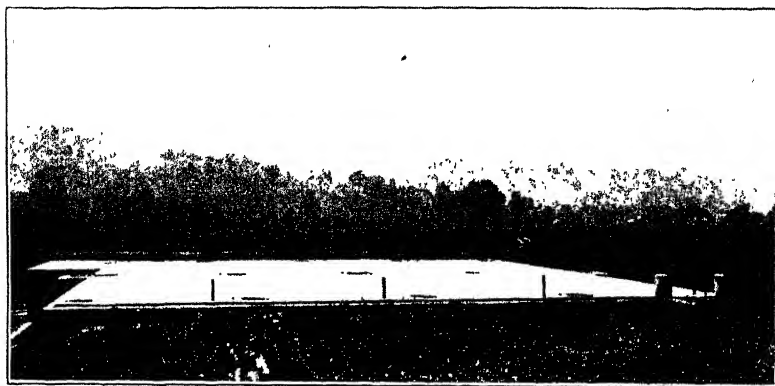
Covered Settling Tanks of Polk Disposal Plant
